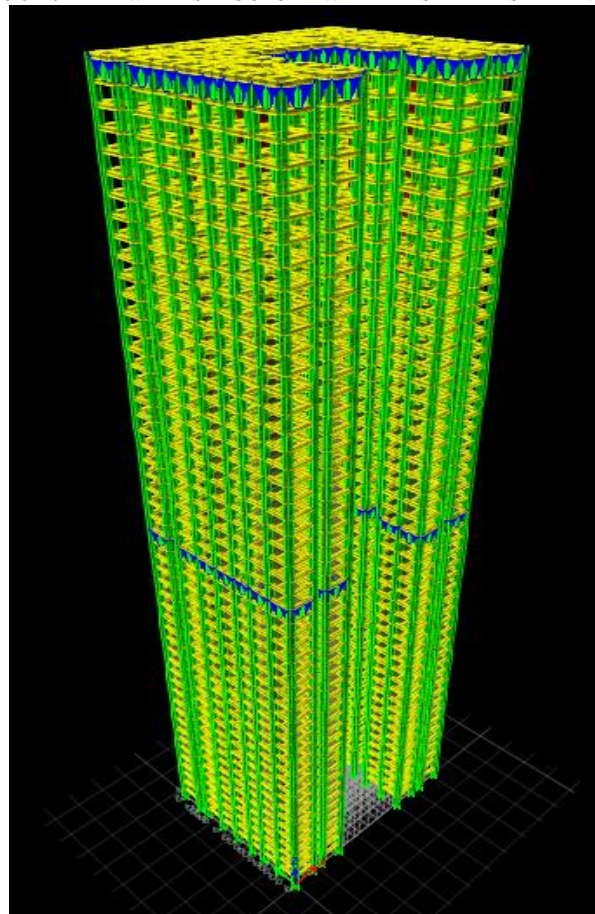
ELEVATION (MODEL NO 4 - OUTRIGGER AT TOP & 0.5H i.e. HEIGHT OF BUILDING)
